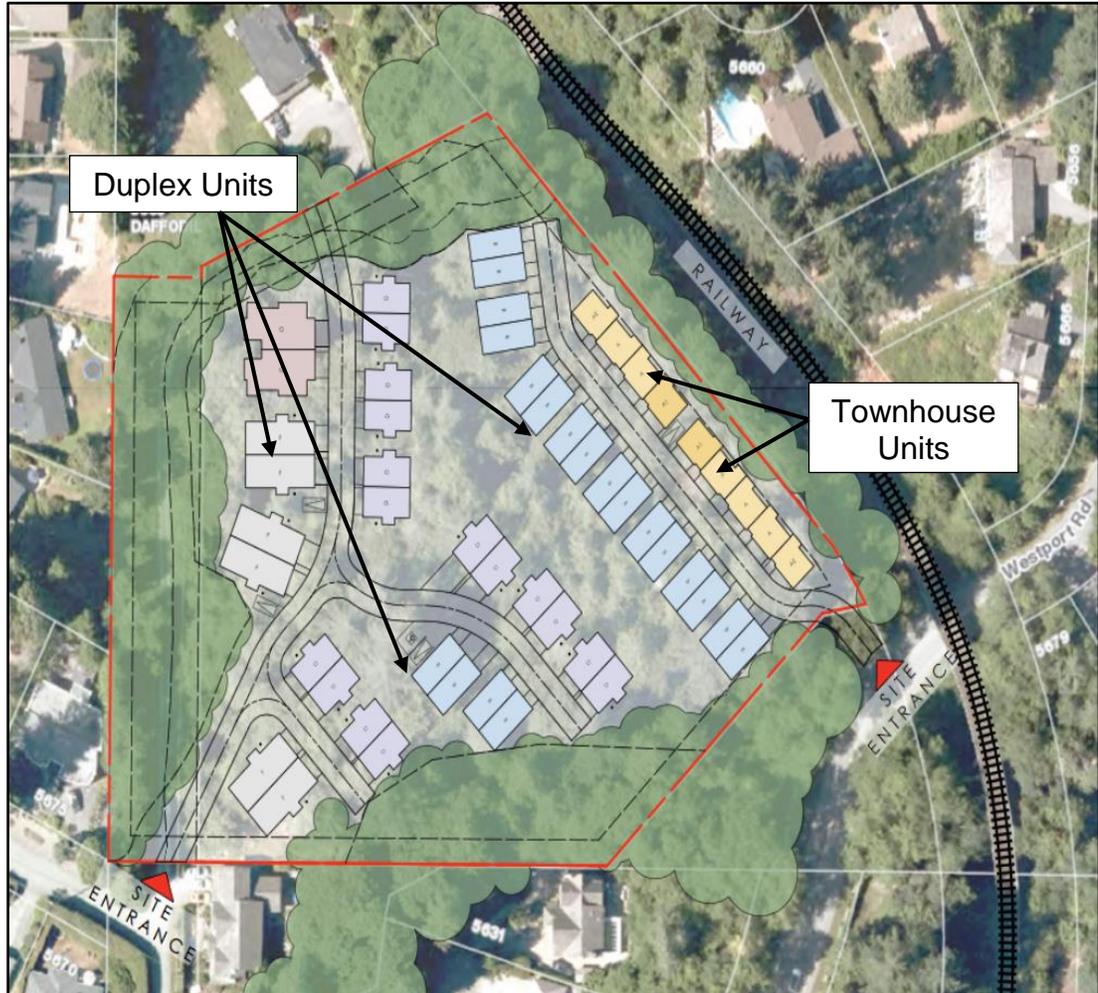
Preliminary Site Plan (site shown with dashed outline)
